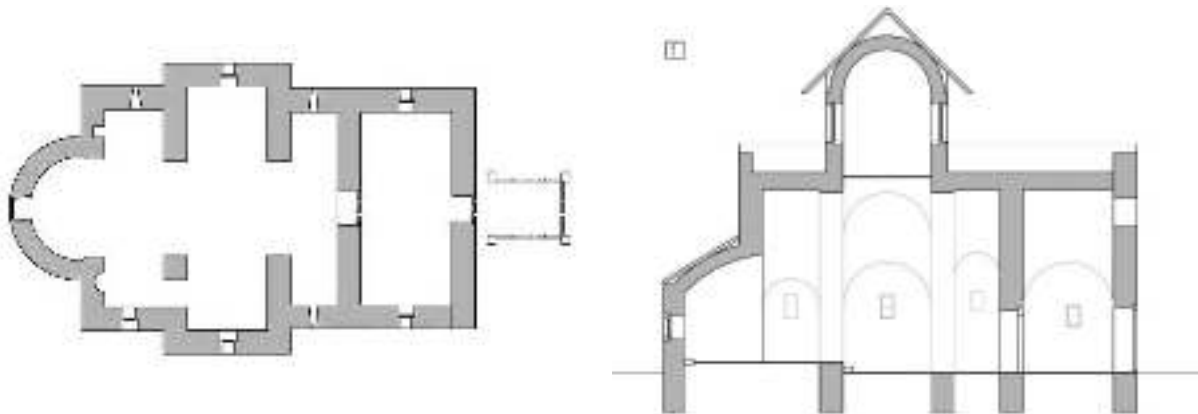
Monastery Dobrilovina – church plan and longitudinal section
